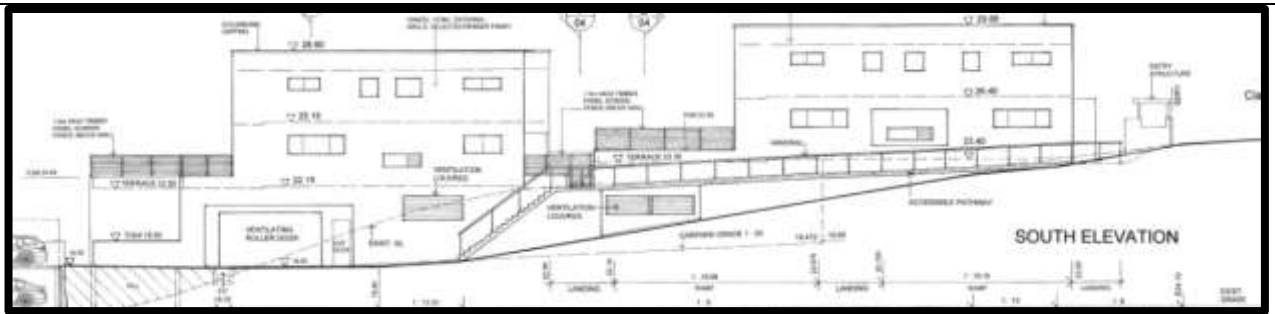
Extract of southern side elevation of Units 2 - 3 (Source: BoDesign, 18)
